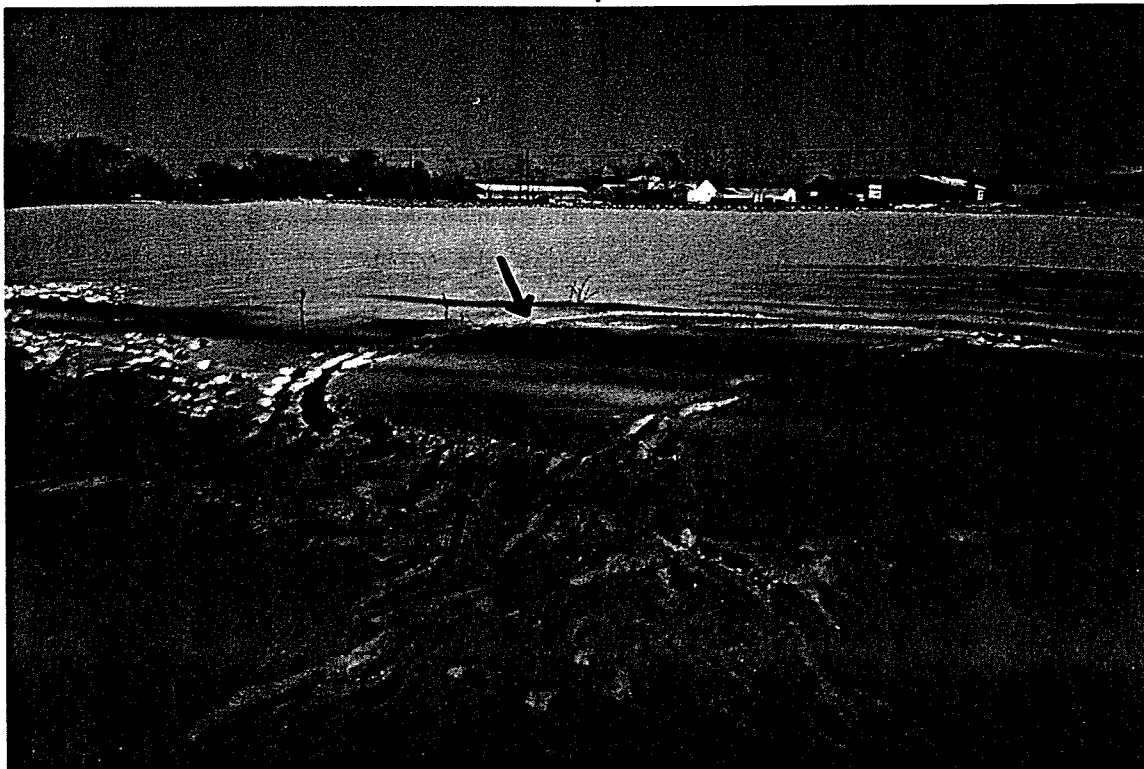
View of concrete silo foundation located in the south central portion of Parcel A - location of demolished barn.
